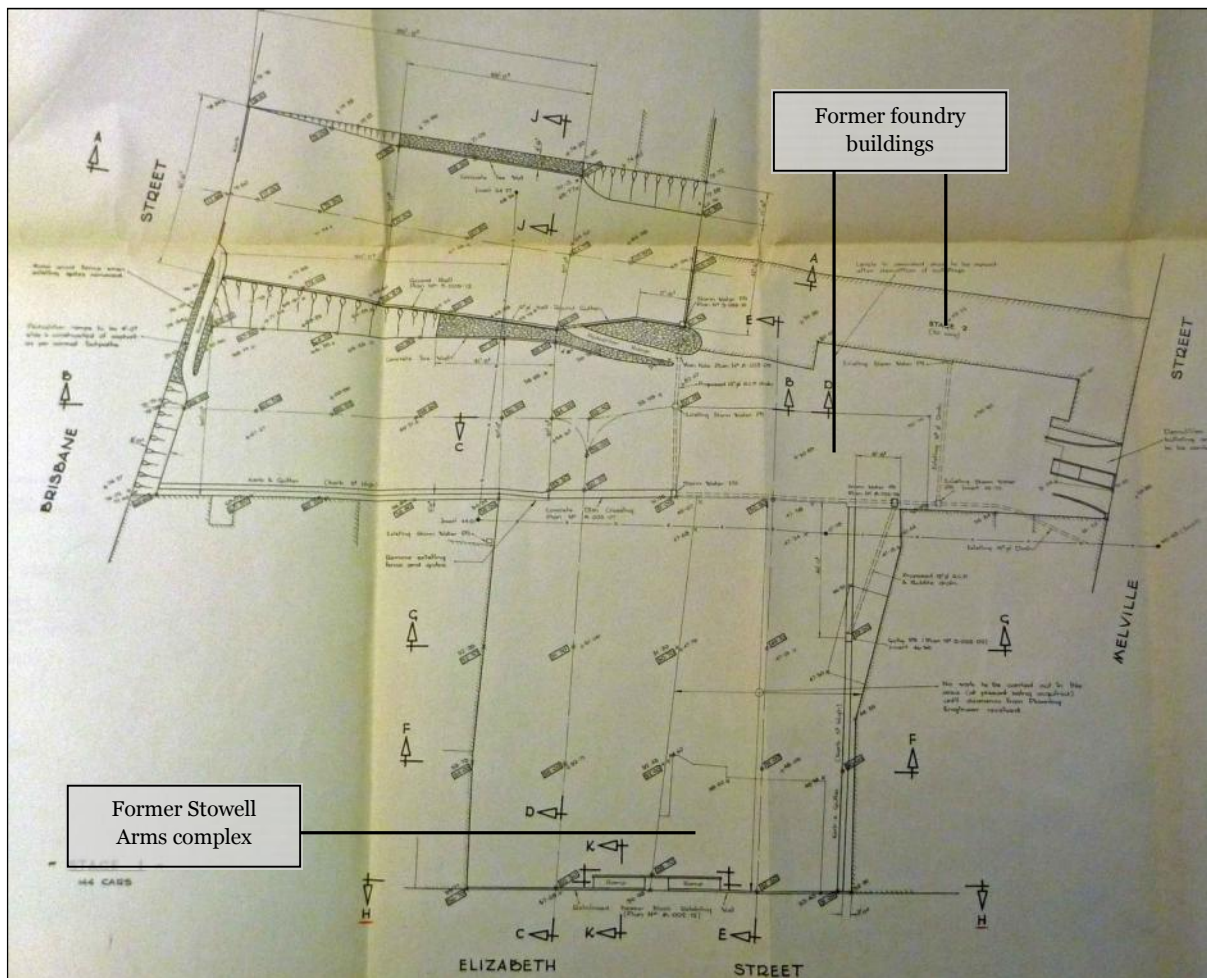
c.1966 car park plan with building locations indicated. North to right (TAHO, MCC16/2/1/757, Melville St - Off street car parks various. Reproduced with permission).
